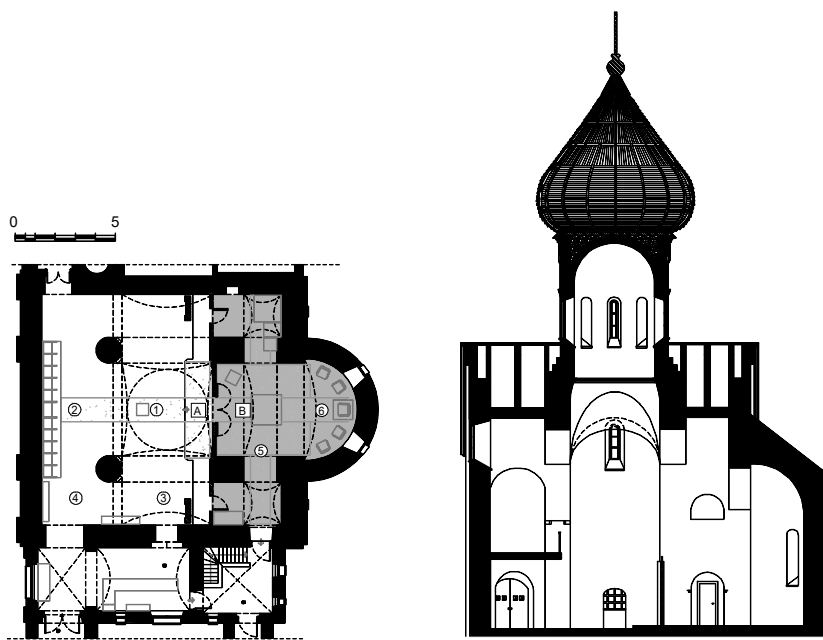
Plan and cross section of the church with indication of source (A and B) and receiver (1-6) placement.
